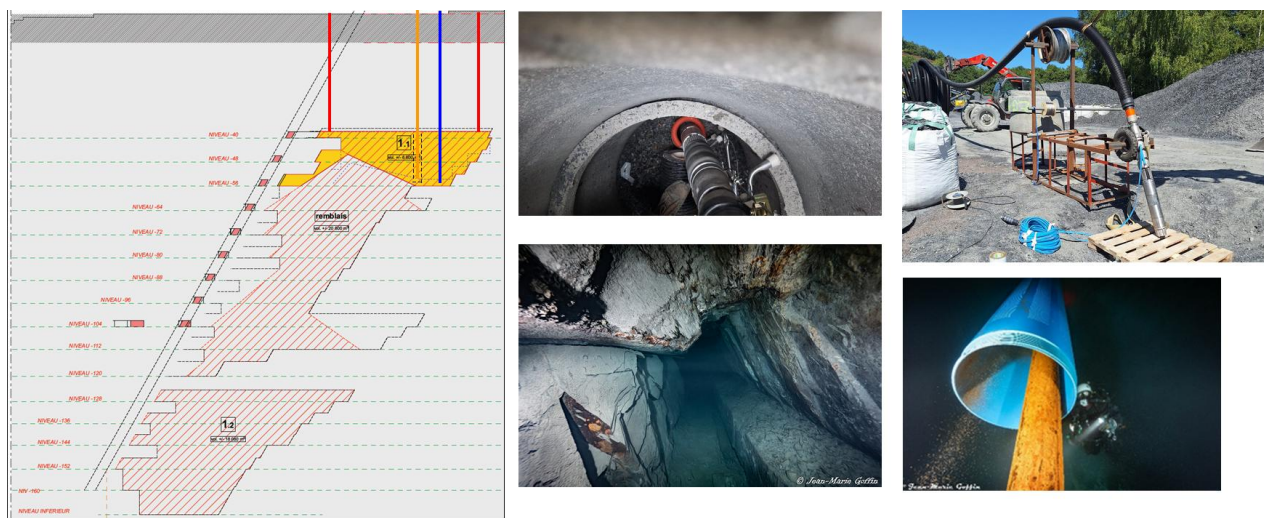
Representation of underground storage. Left: Cross-sectional plans with boreholes. Top: Underground pump outside and inside the access shaft. Bottom: Interior of the underground storage, with access tunnel and diffusion system.
